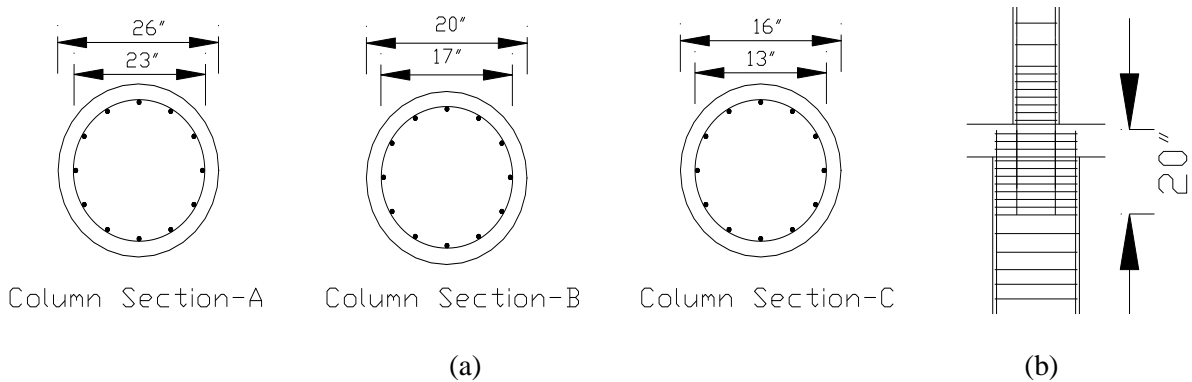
(a) Reinforcement details of column sections, (b) Magnified view of lapping of column reinforcement
